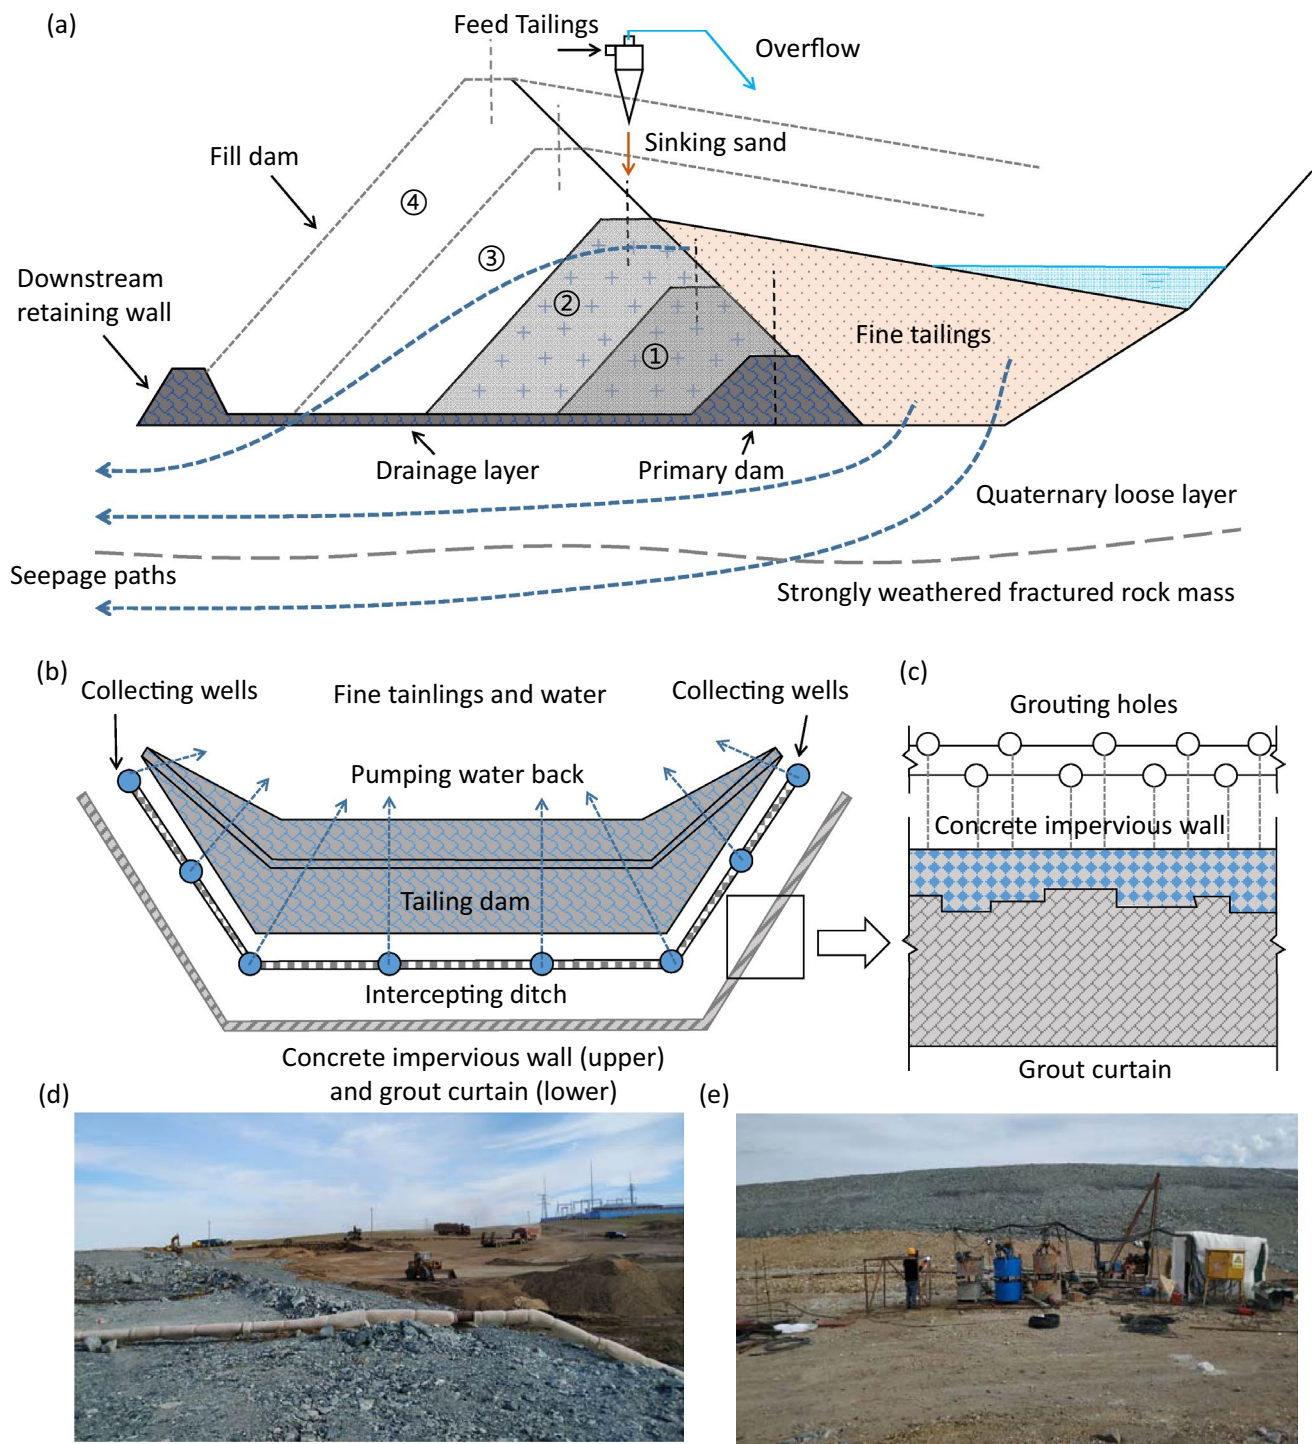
Using the IBD model to remediate a tailings pond seepage problem. a Tailings dam structure and seepage paths. b Design plan of IBD model. c Design cross section of IBD model. d Construction site. e Grouting station
